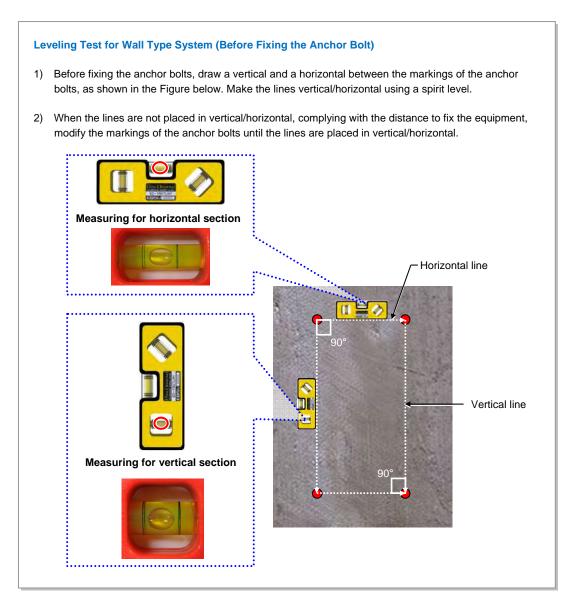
Leveling Test before Fixing Anchor Bolts
